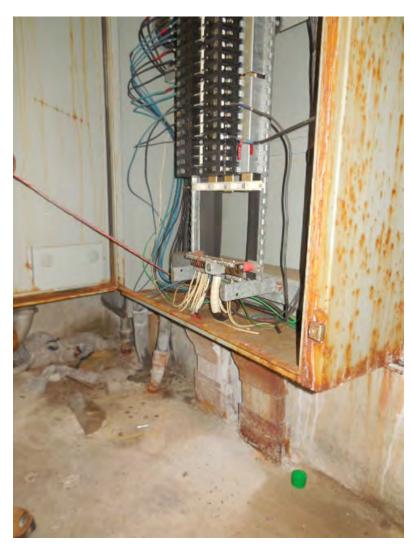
A13 Twinbrook – Pull string installation to AFC Panel
